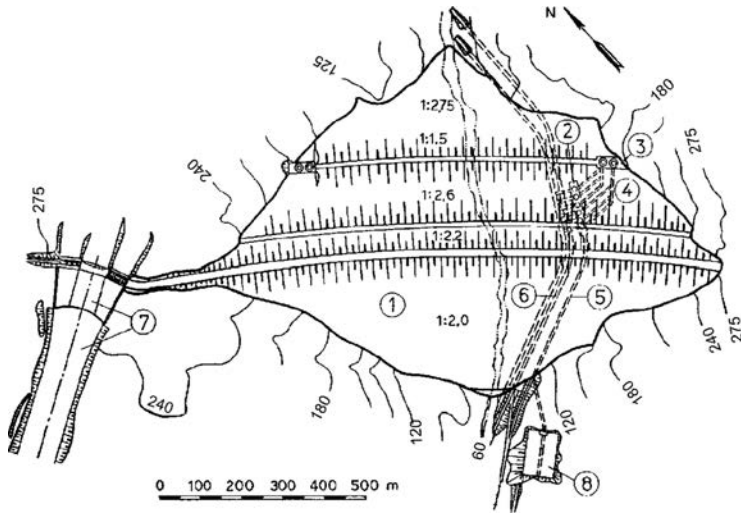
Location plan of the Oroville hydraulic scheme. (1) Earth-rock dam; (2) underground powerhouse; (3) intake tower; (4) supply conduits; (5) access tunnel; (6) diversion tunnels; (7) spillway structure; (8) distribution facility.
